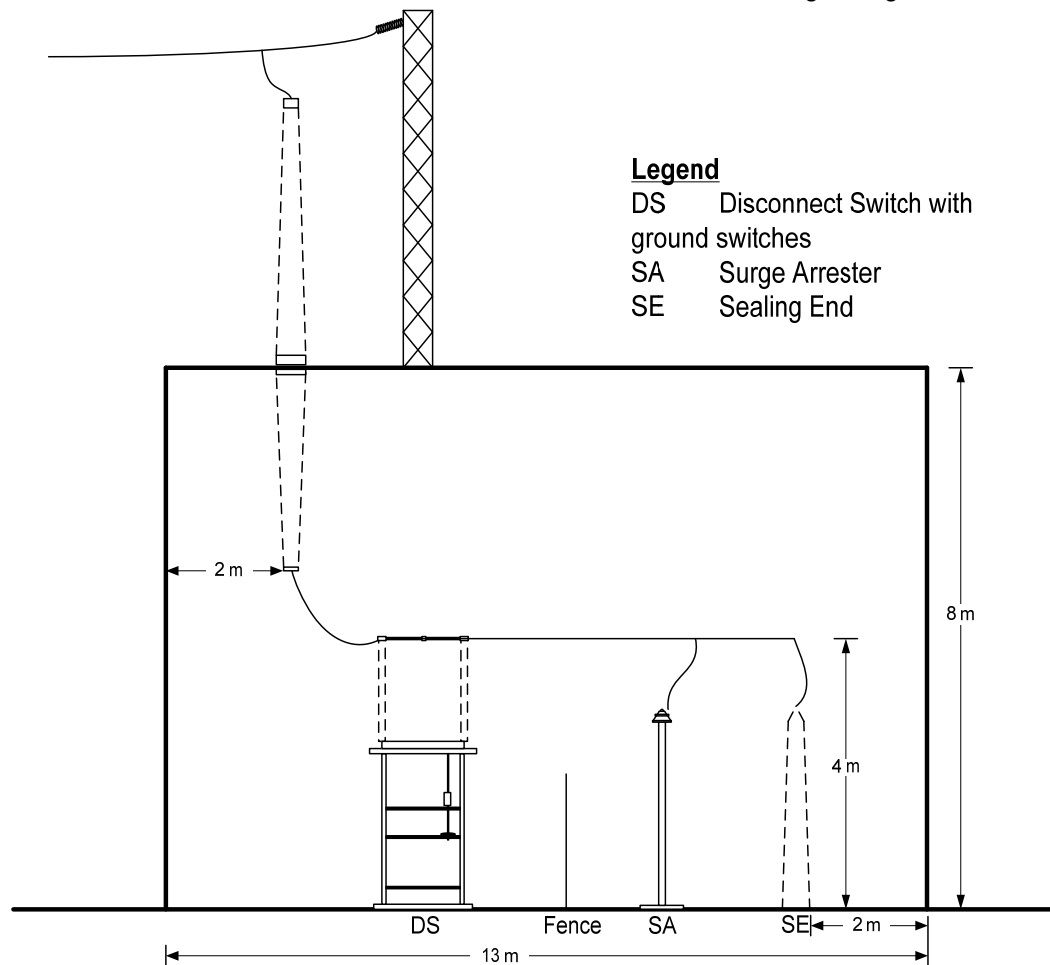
Transition Site - Preliminary Electrical Equipment Layout
